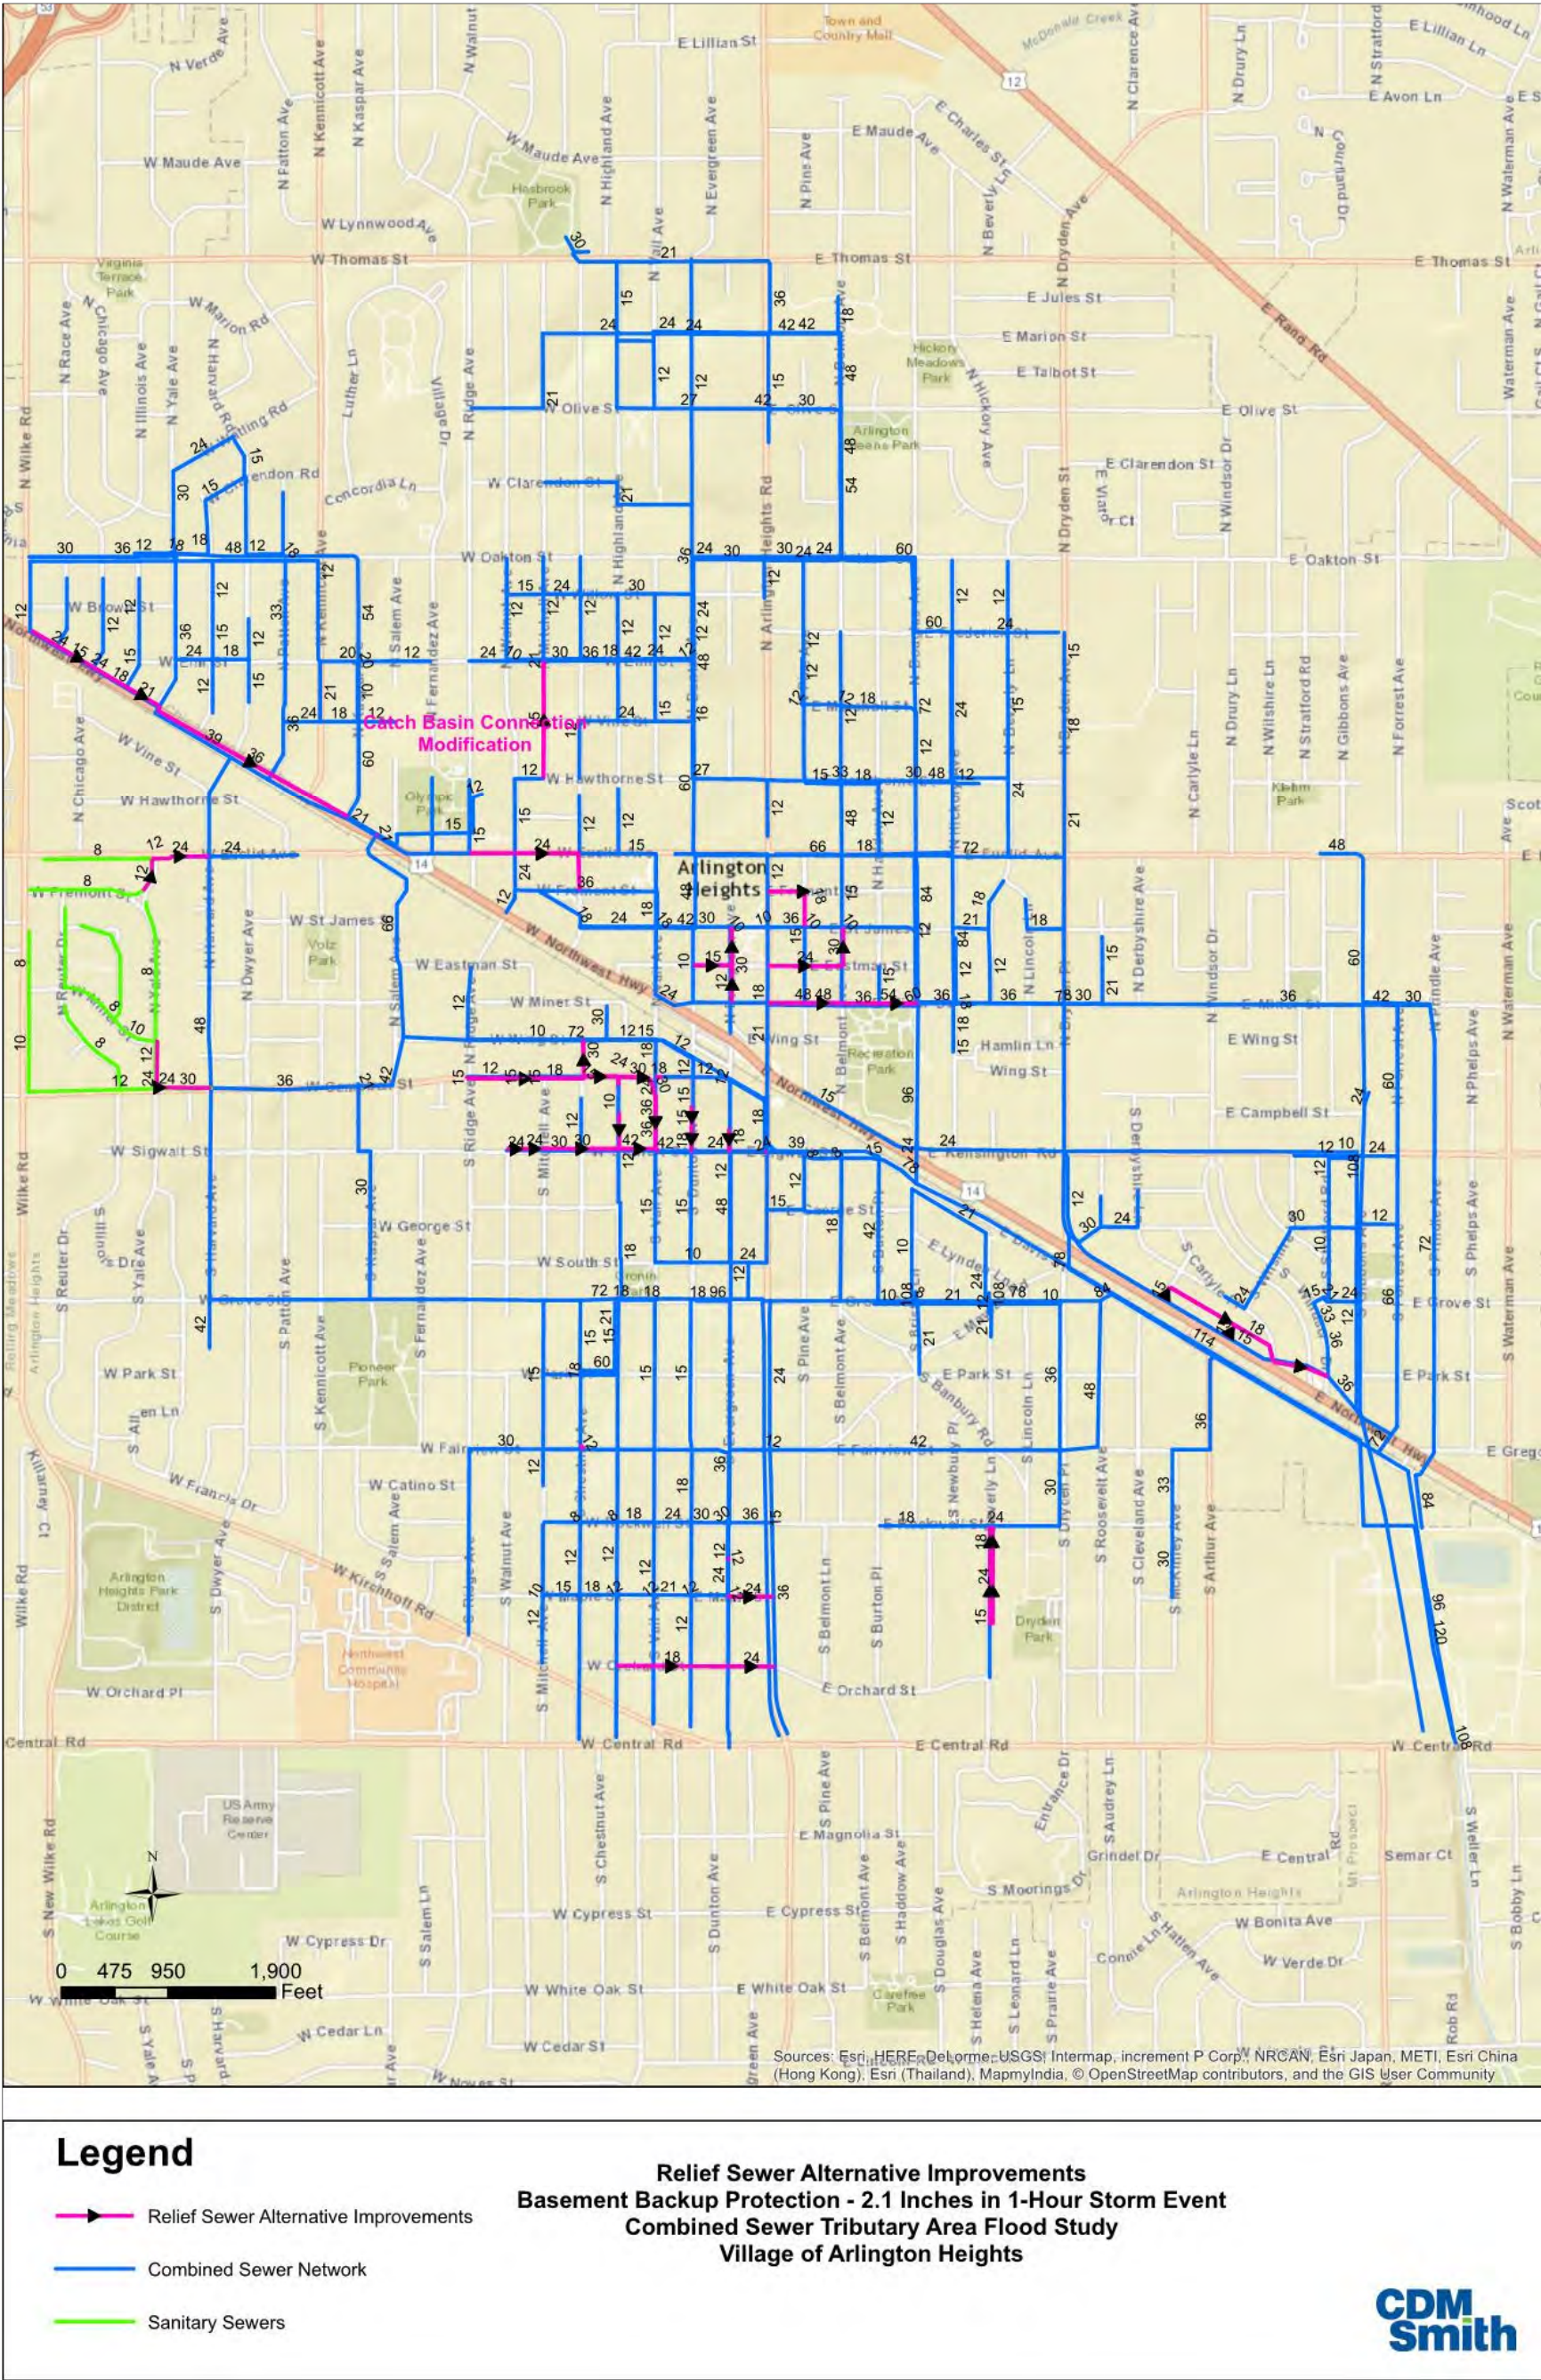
CSTA Relief Sewer Alternative Improvements for Village’s Design Storm
